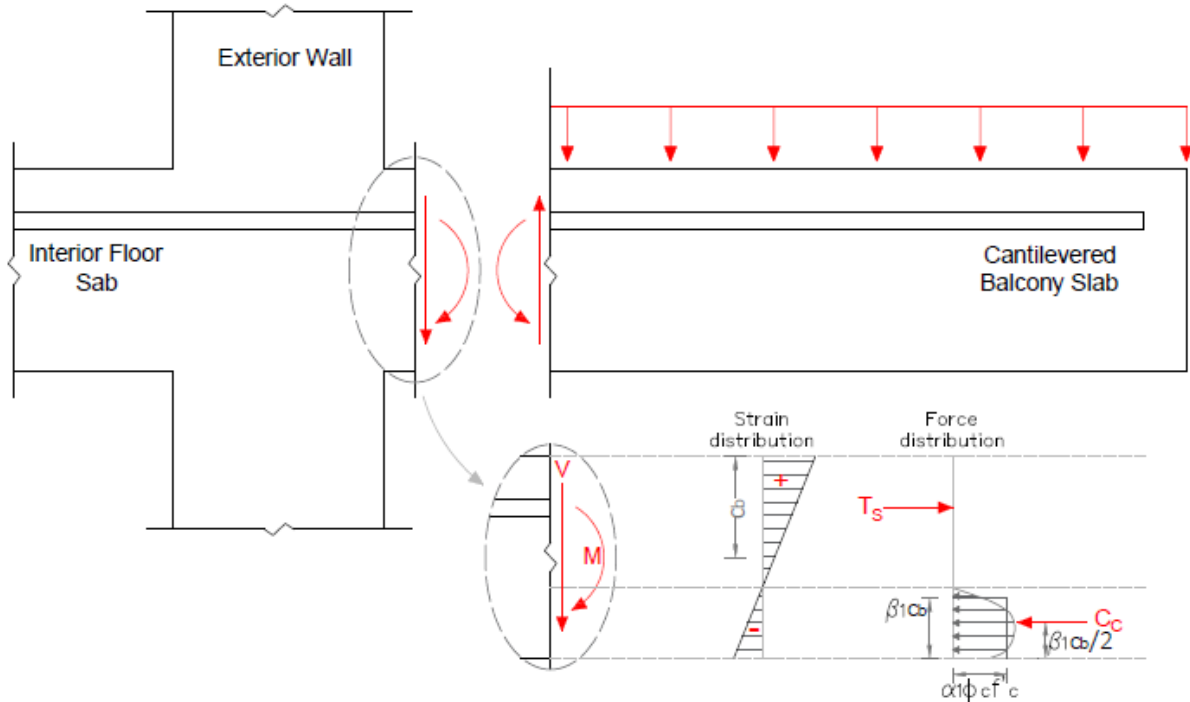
Flexural stressed on reinforced concrete balcony cross-section at wall, shown with simplified reinforcement and the equivalent rectangular stress block for concrete compressive stresses
